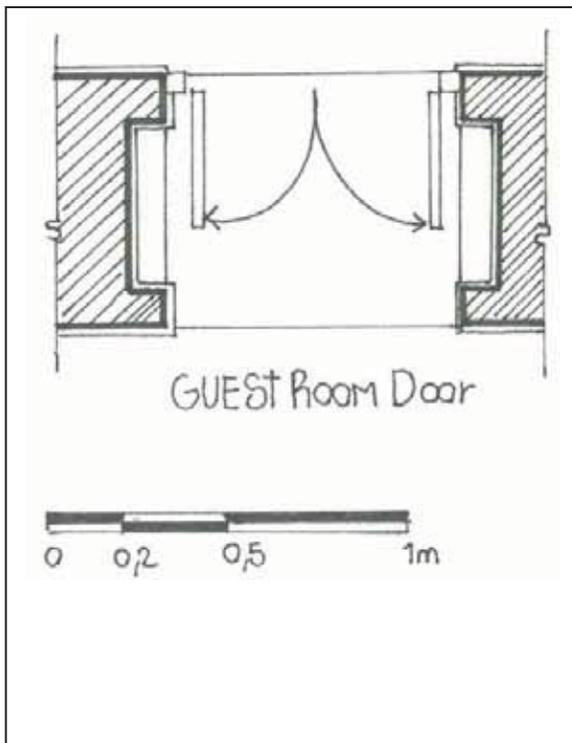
Plan of the guest room door. Drawing by author, 2008.
